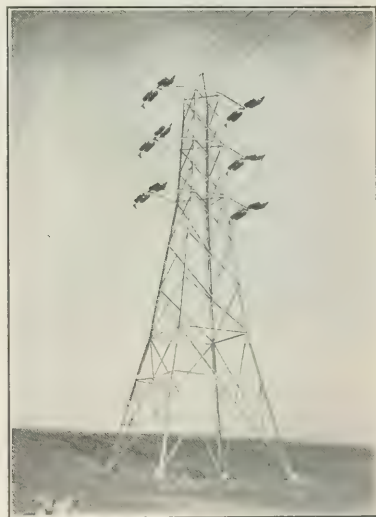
ANCHOR TOWER WITH STRAND INSULATORS
